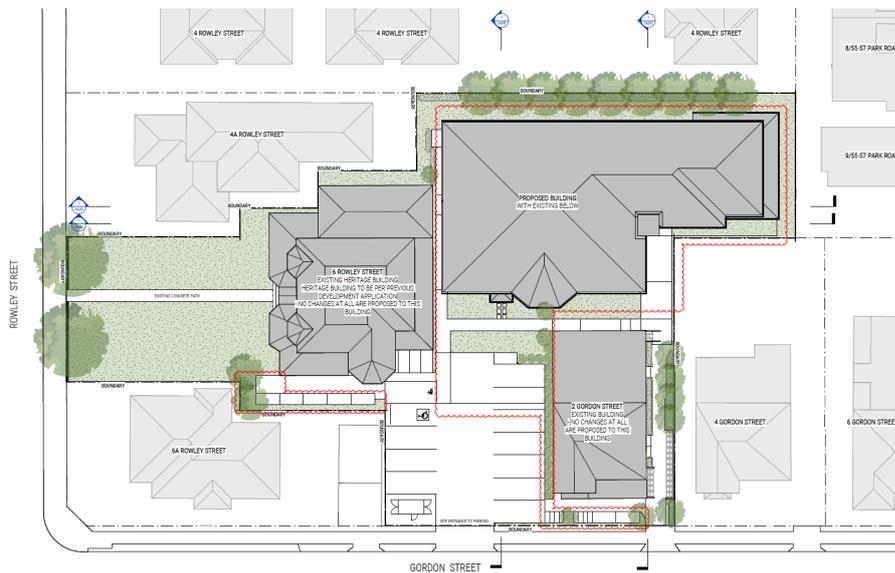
Proposed site plan showing the modified scope clouded in red. (Source: Extract drawing DA040, Walsh Architects)
